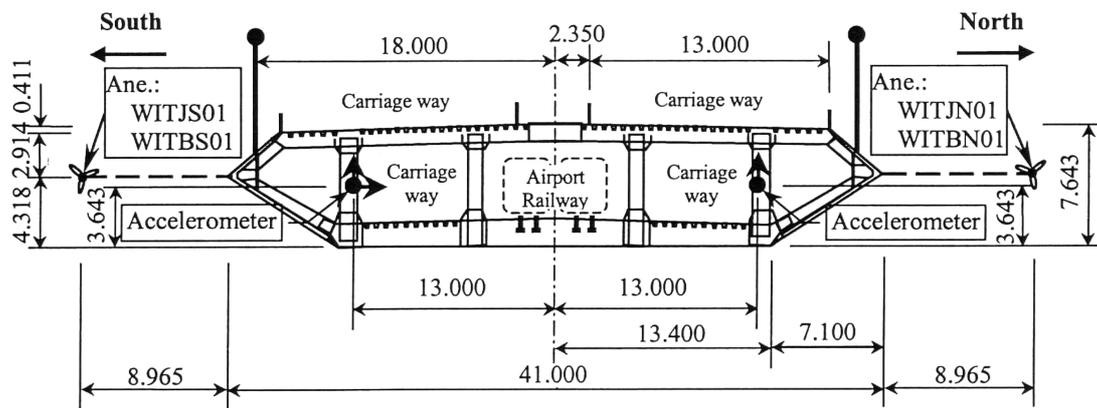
Cross-section of bridge deck and sensor locations (dimensions in metre)
